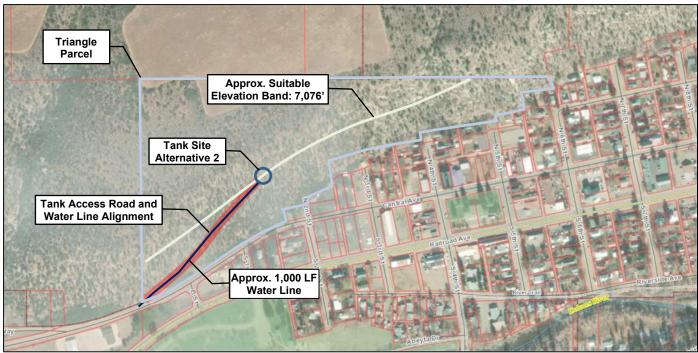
Tank Site Alternative 2, Triangle Parcel
